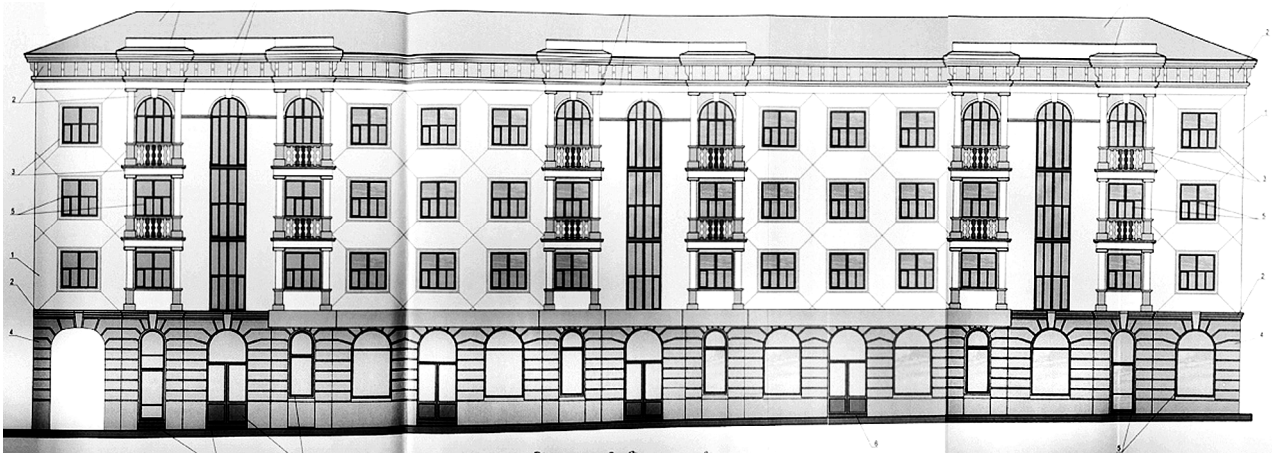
The facade. Residential house on 81 Soborna Str., Vinnytsia (Rekuta, 2007)
